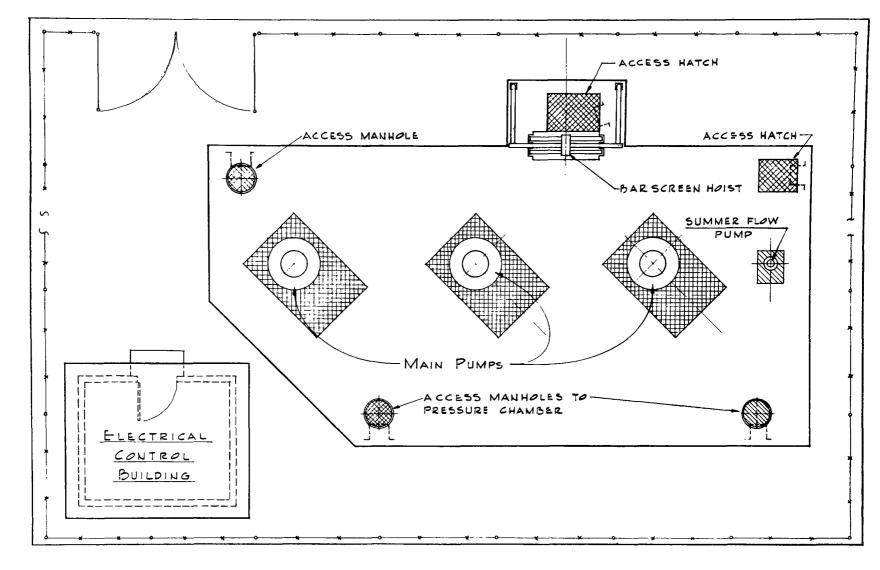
PLAN AT GRADE OF TYPICAL SUBSURFACE PUMP STATION
